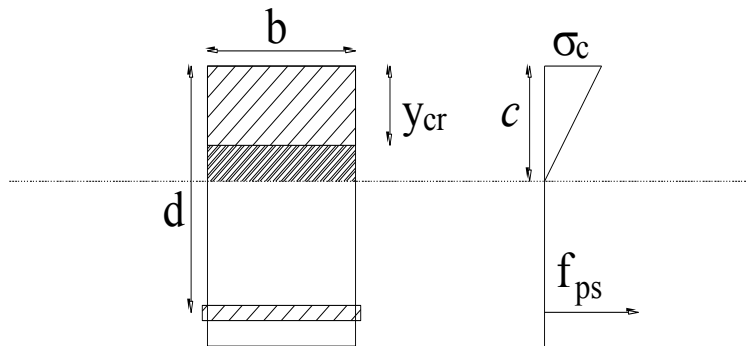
Schematic of typical stress diagram for a cracked prestressed concrete section
